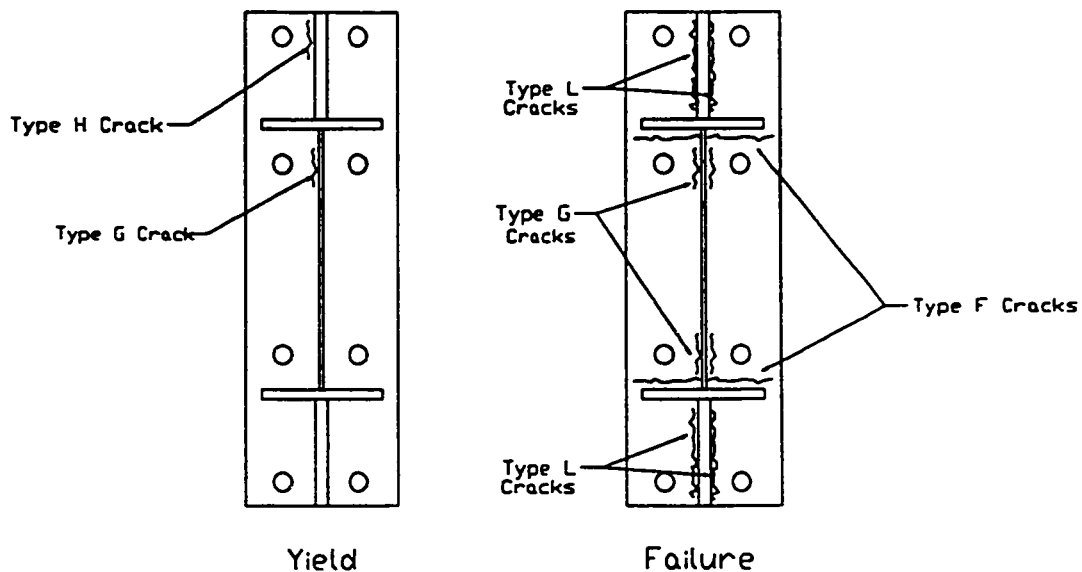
Crack Locations at Yield and Failure for Connection M-6
